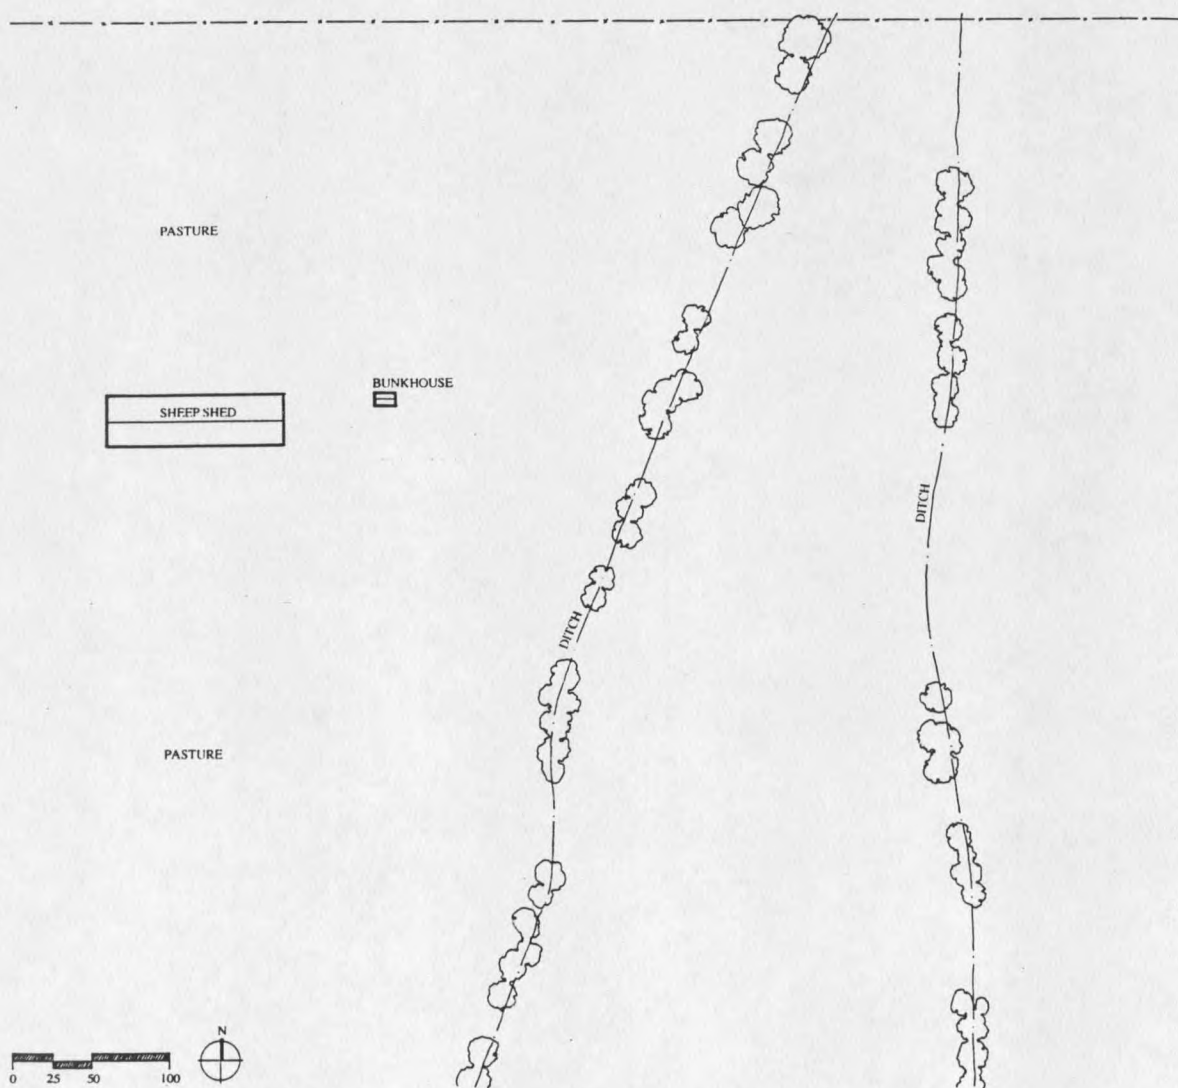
Site #3 - Site plan in 1915 when the sheep shed was constructed. For at least 25 years prior to this time, the log house, granary, frame house, and two story horse barn had stood on the adjacent land to the east.
